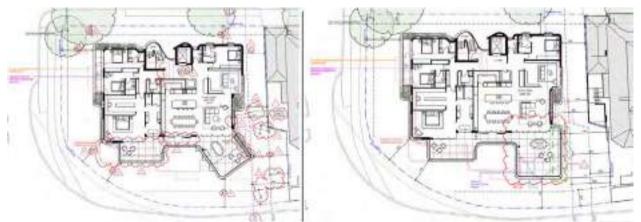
& 6 – Level 3 Plan, DA-103 Issue C (left) and Level 3, DA-103 Issue E (right)
